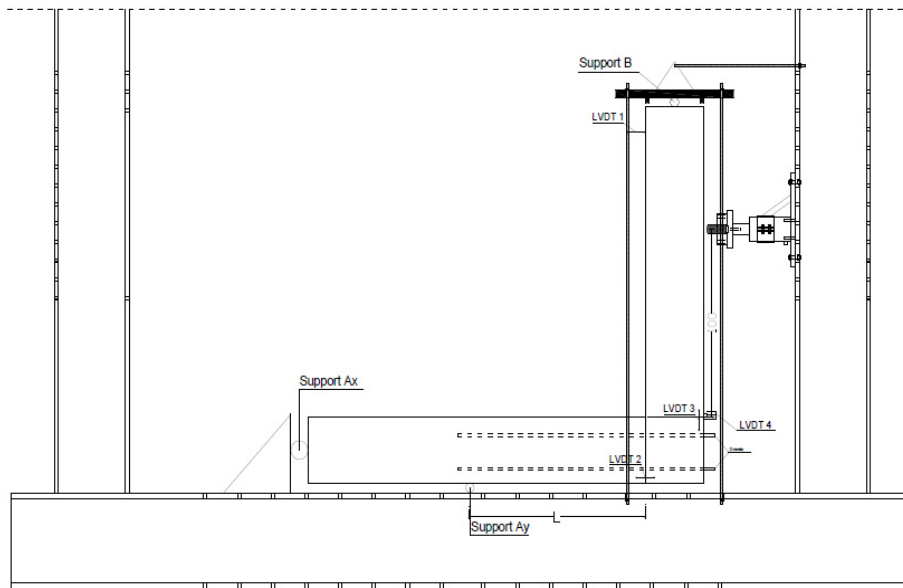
Test set-up and instrumentation of the specimen with horizontal dowels
